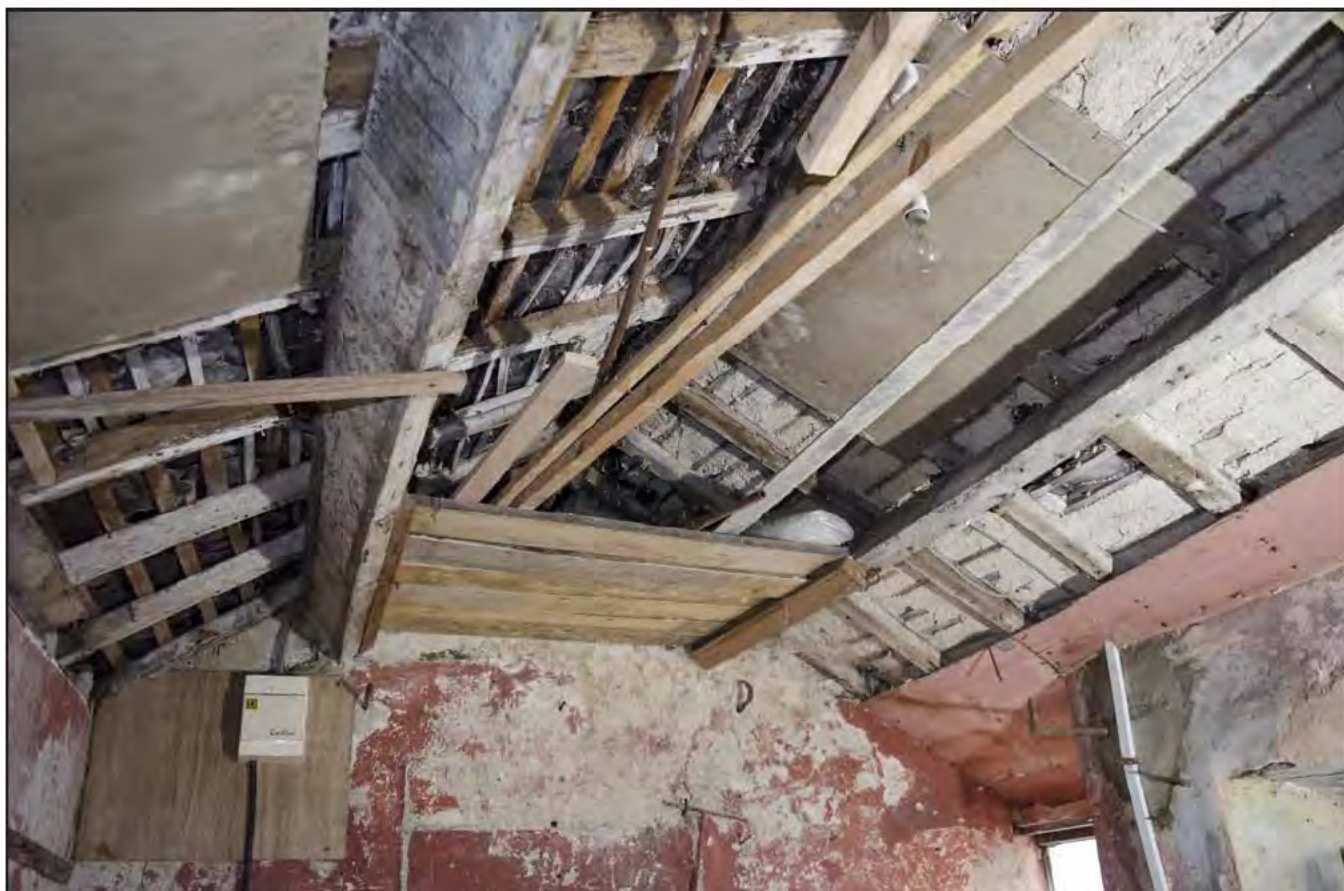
Ceiling above fireplace on north wall (archive reference: G2623\_021).
